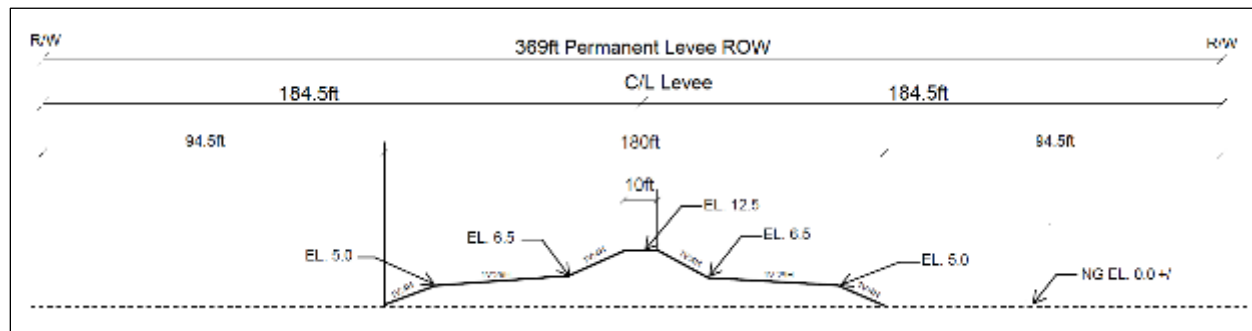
Typical Levee Section for 2035 Design Elevation
